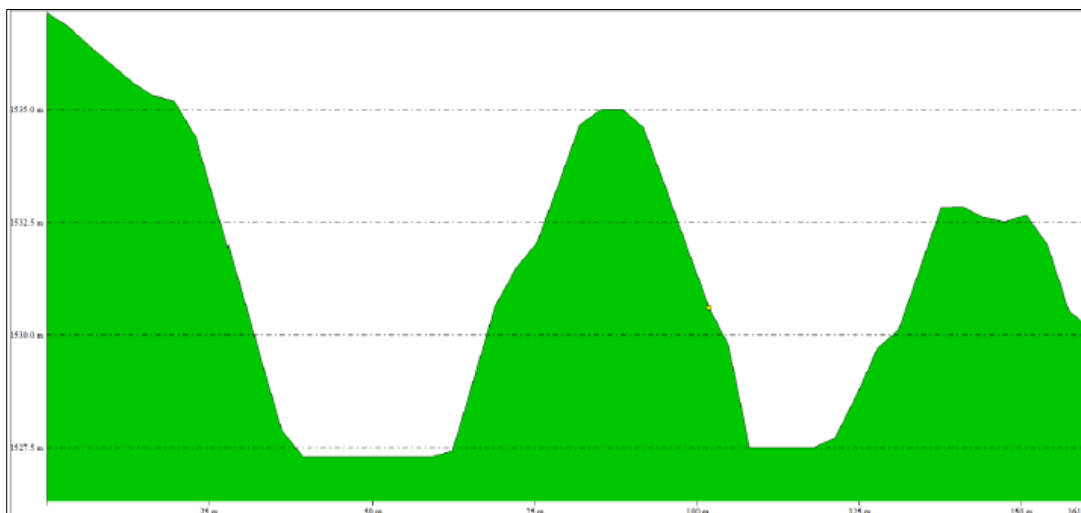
Section 1 with proposed channel left, 2,5m vertical intervals, 25 m horizontal
